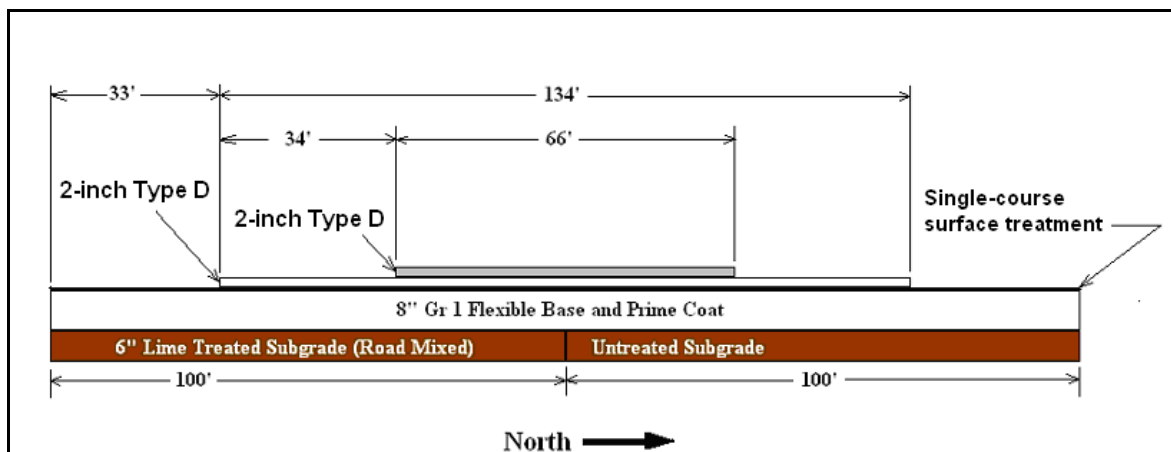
Schematic Layout of Test Sections Placed at the Riverside Campus.
